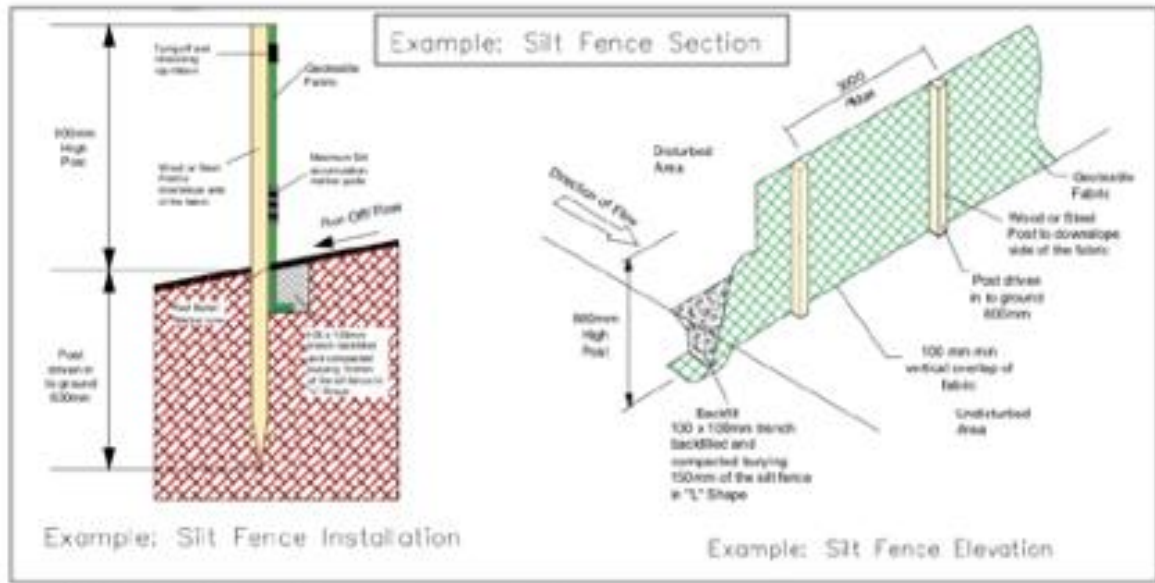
An example of the silt trap to be erected before the commencement of works on site.
